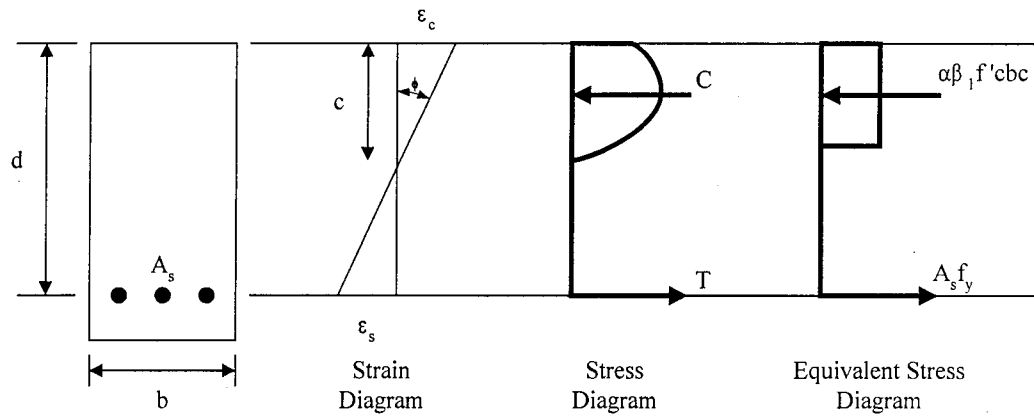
Strain and Stress Diagrams for a Typical Reinforced Concrete Beam
